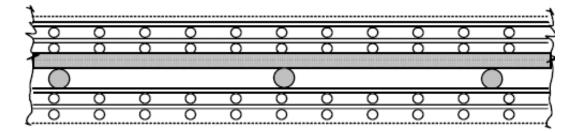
Detail section of wire mesh and steel reinforcement configuration for ferro-cement
